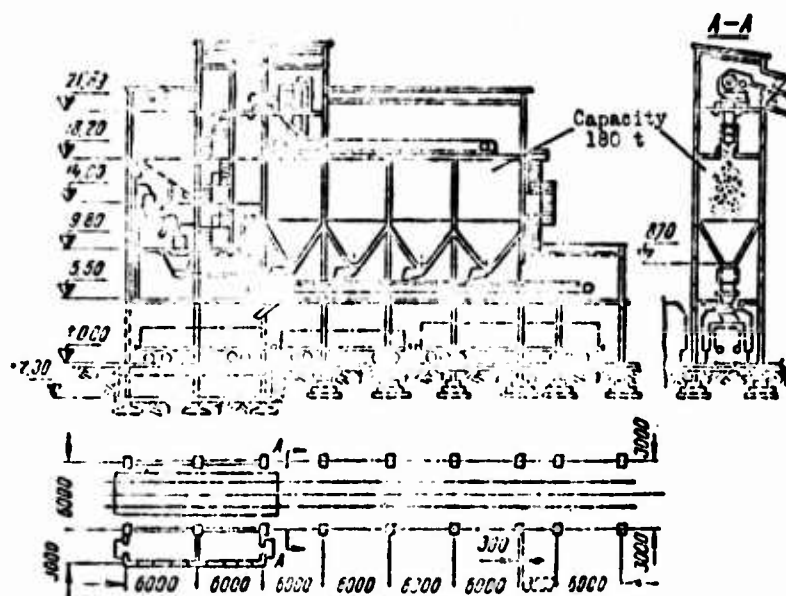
A ferroconcrete loading hopper with a capacity of 720 t along with central loading.
